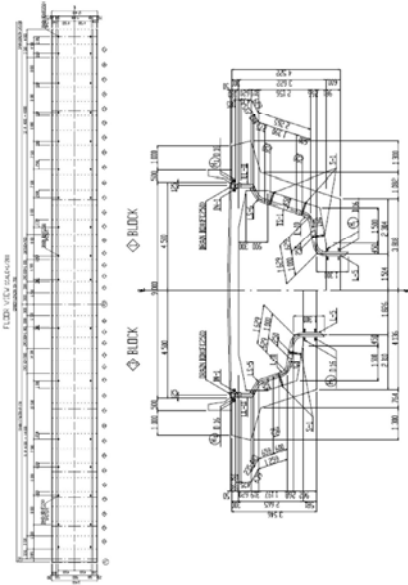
Details of Drainage Pipes (PC-box Girder)
